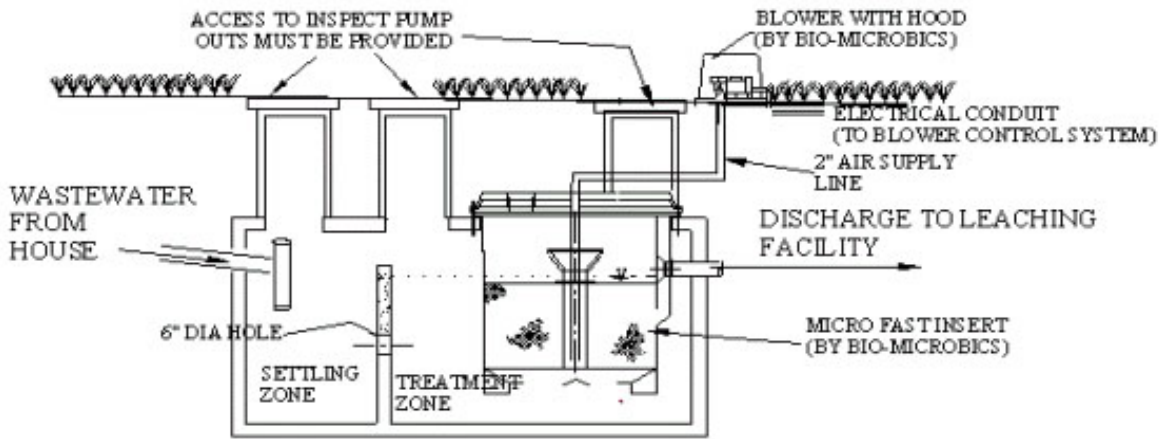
Profile of FAST system at the Massachusetts Alternative Septic System Test Center.
